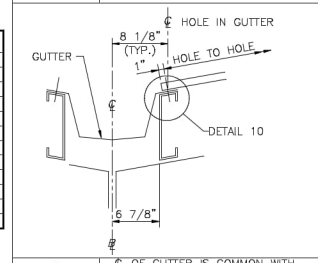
MR-24 SEAMED RIDGE ROOF SYSTEM
